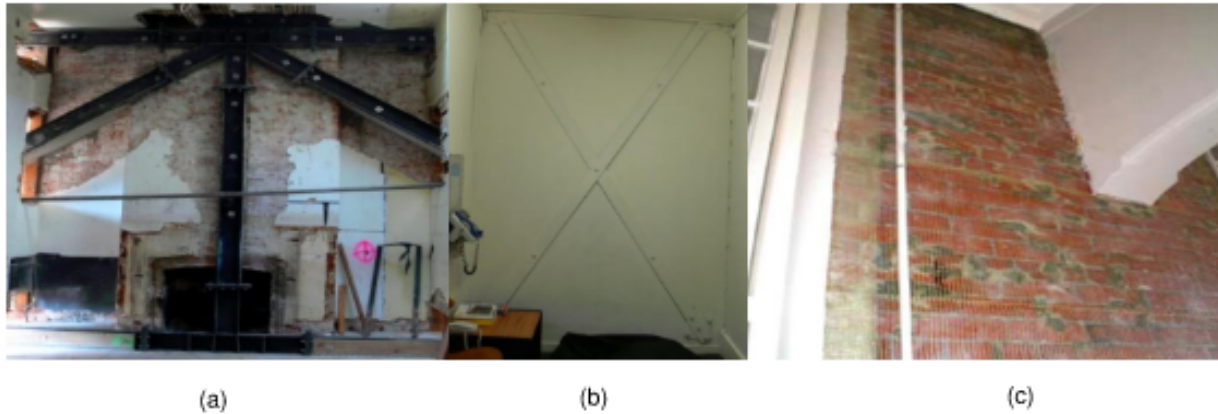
(a) TSB Bank Building Steel Brace Frame (b) X Backpackers Steel Brace Frame (c) Shirley Community Center FRP
